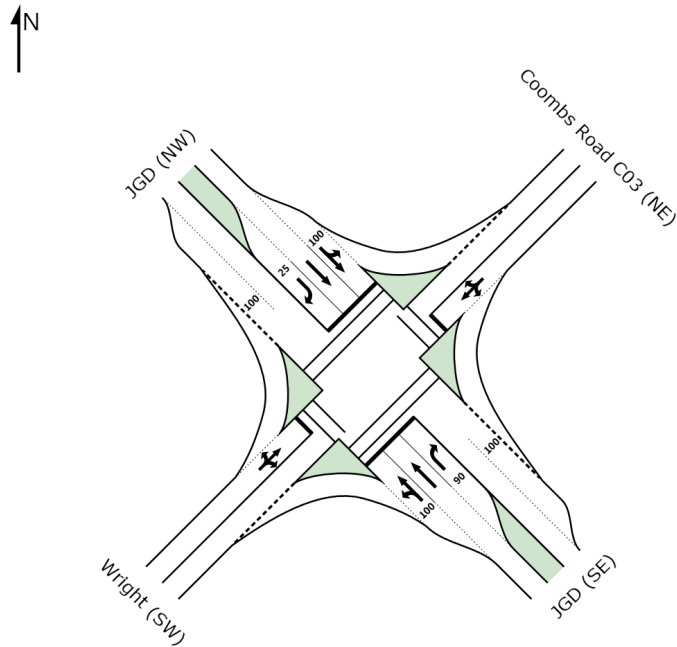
JGD/Road C03/Road 01 Ultimate Stage Intersection Layout
